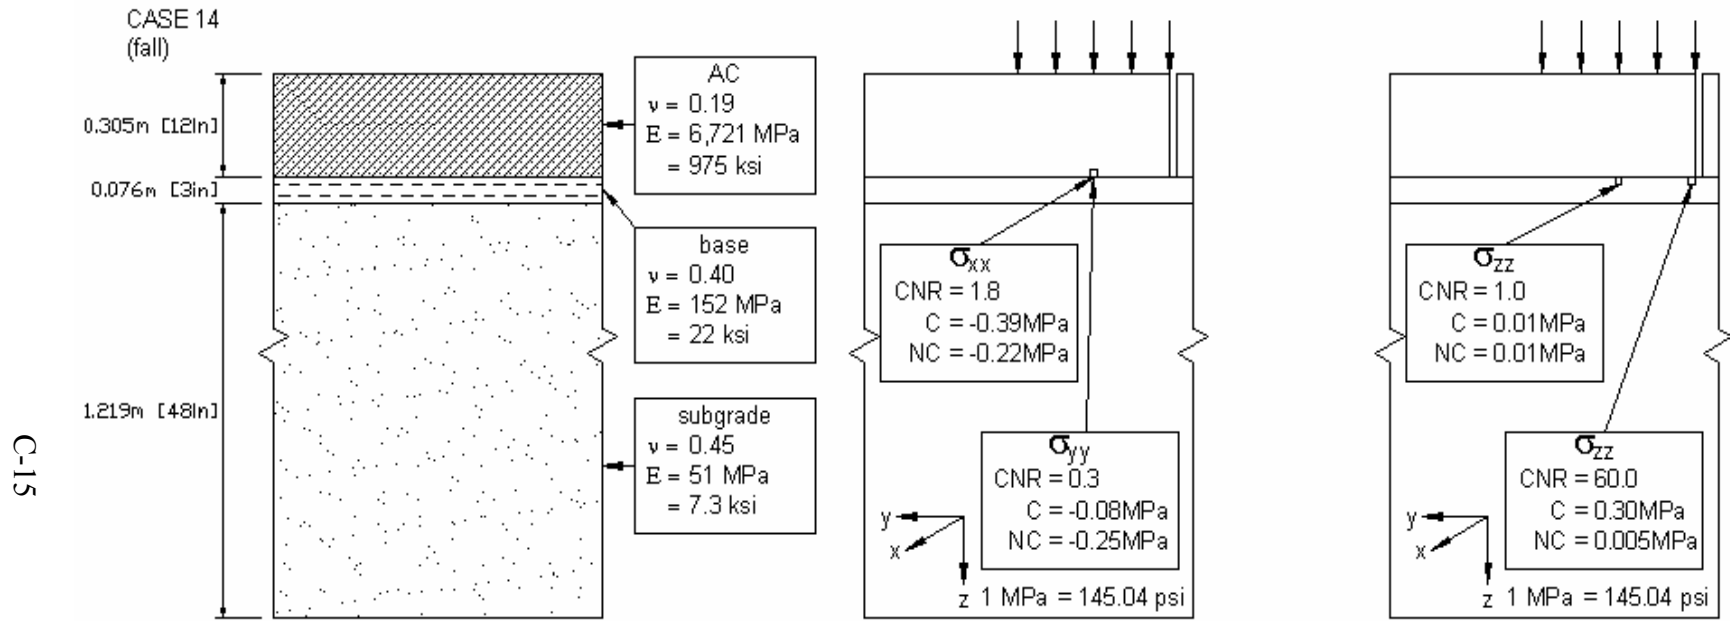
Summary cross section for case 14, (C – stress in cracked pavement, NC – stress in pavement with no crack, CNR – crack/no crack (stress) ratio)
